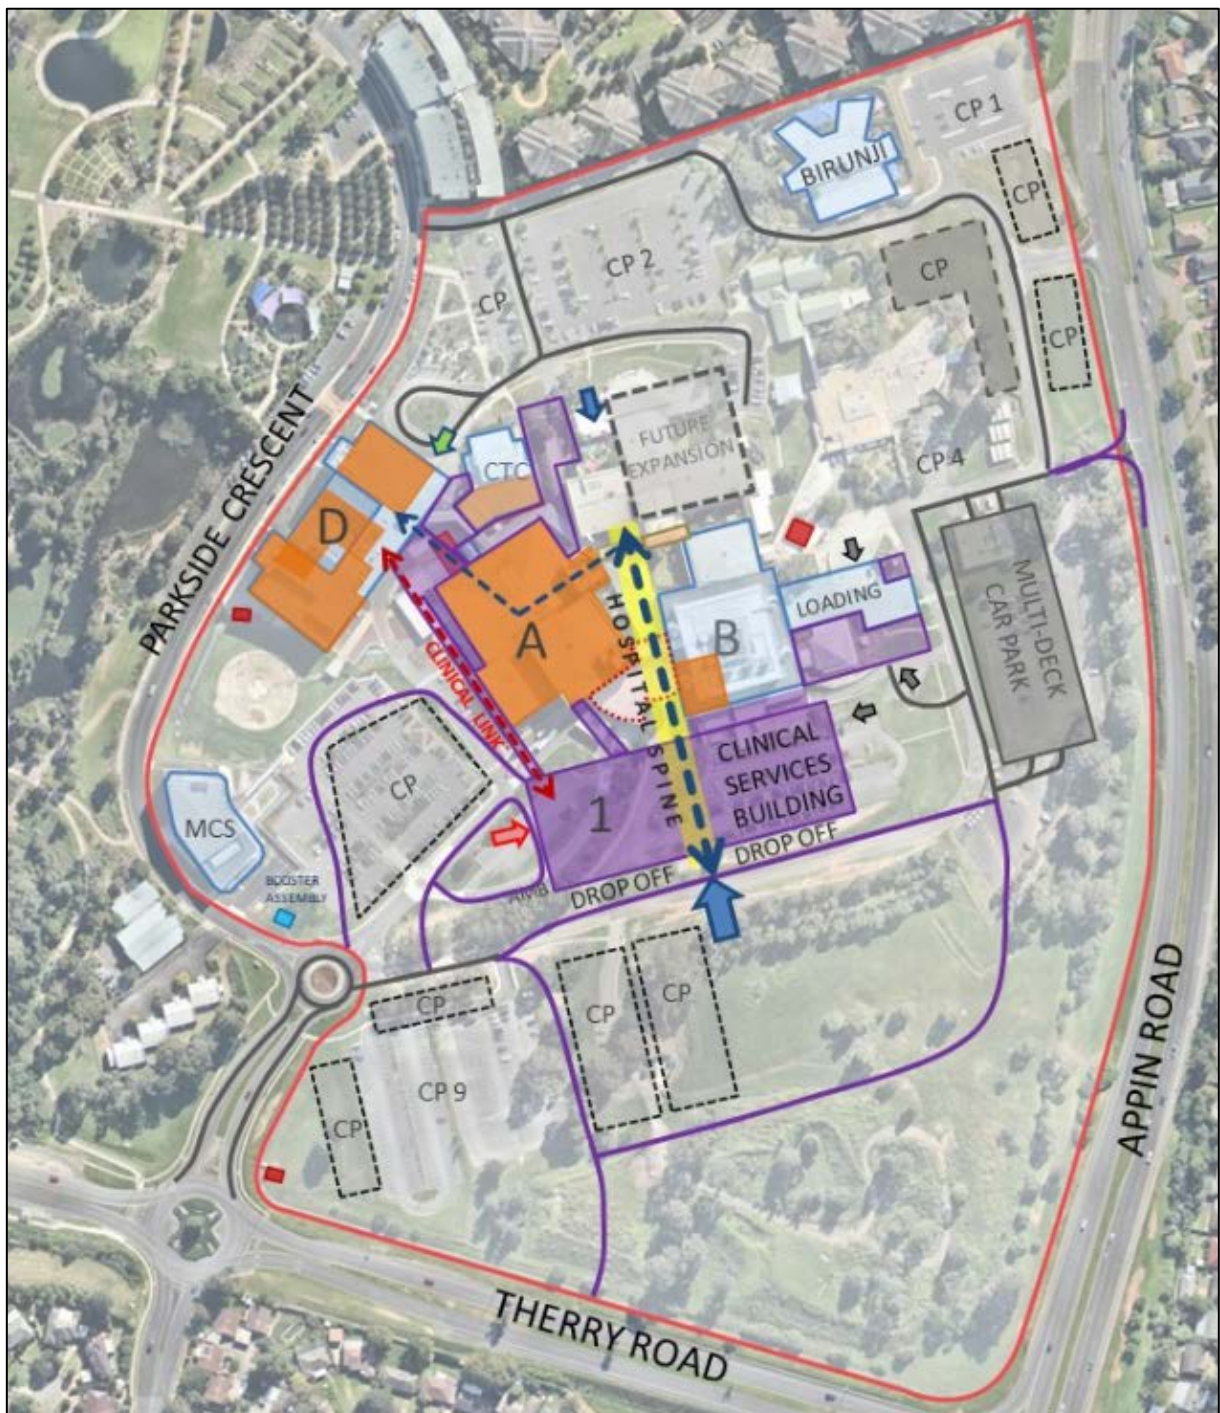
Location of site structures to be demolished and rebuilt (purple) or renovated (orange)
